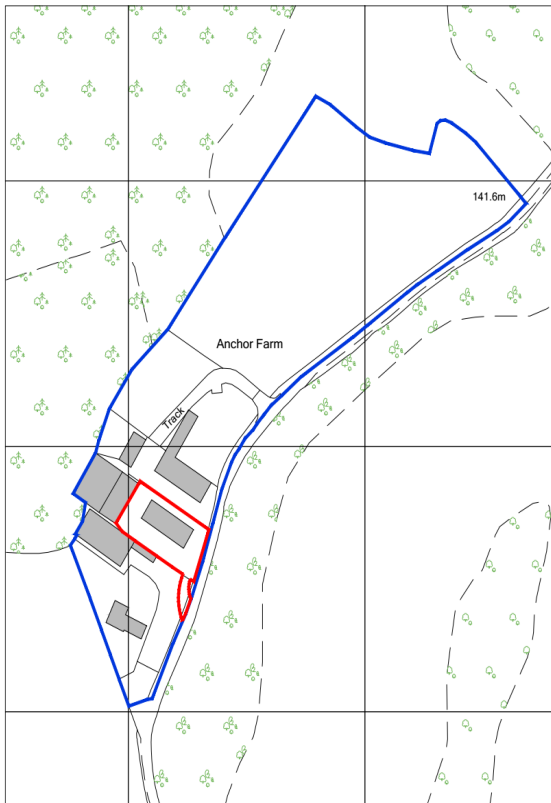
Block Plan: Anchor Farm, Dodworth, S75 4LD
